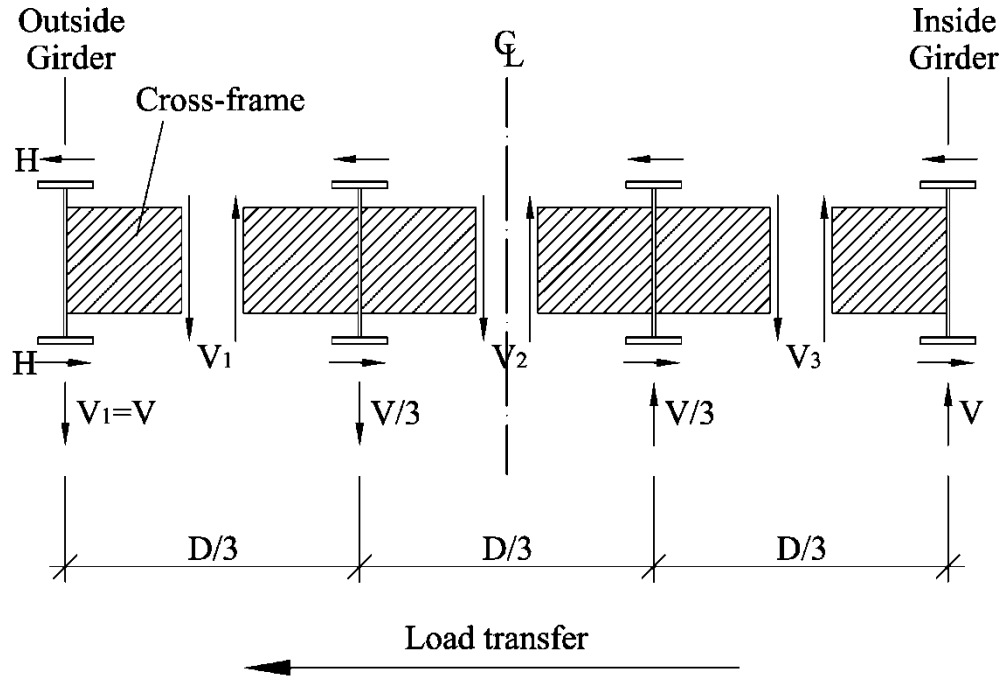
Forces in multiple girder system (Adapted from Poellot, 1987)
